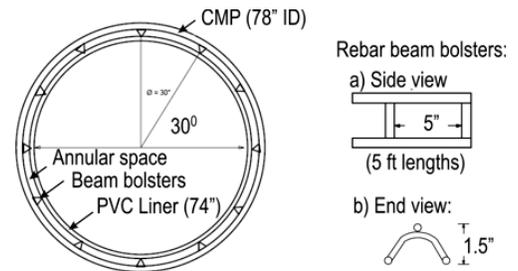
Rebar beam bolsters designed in a CMP (Danby Pipe Renovation, 2007, modified)
